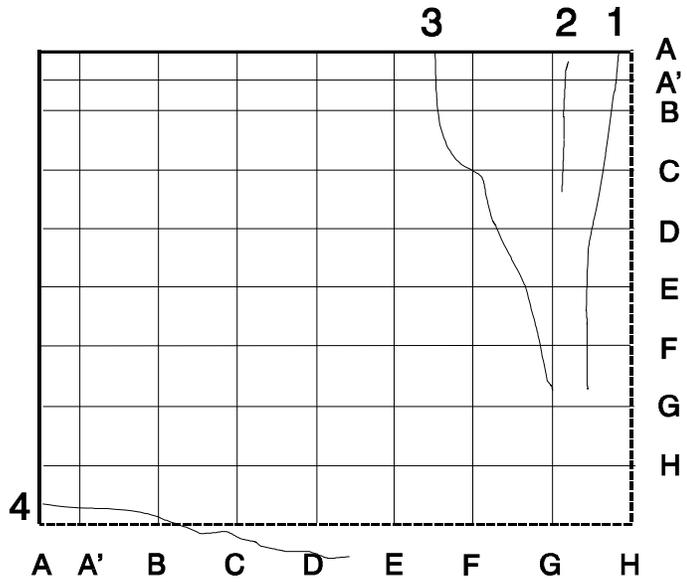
POJ-PU-54-TH cracking pattern on north face of joint at service load
